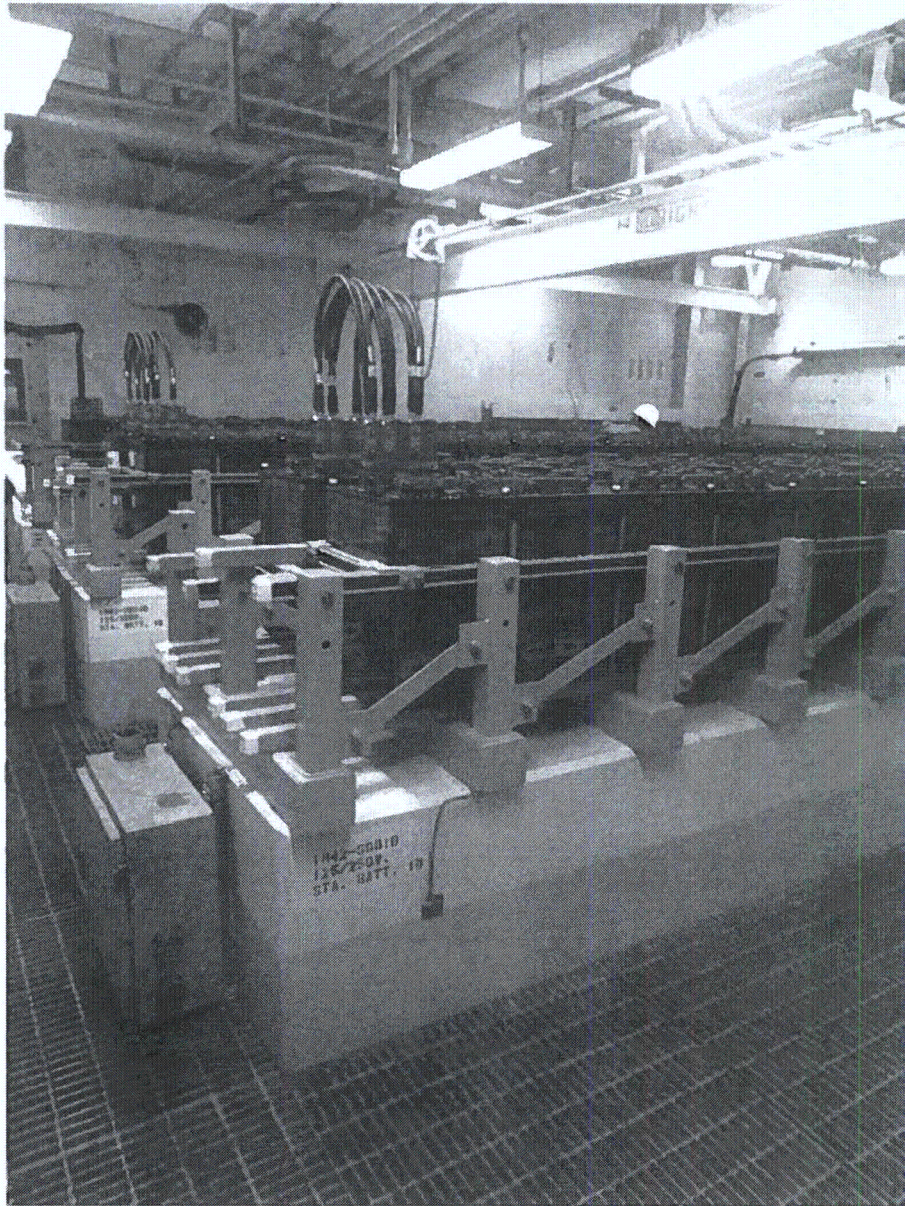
Equipment Elevation Showing Typical Anchorage Configuration
